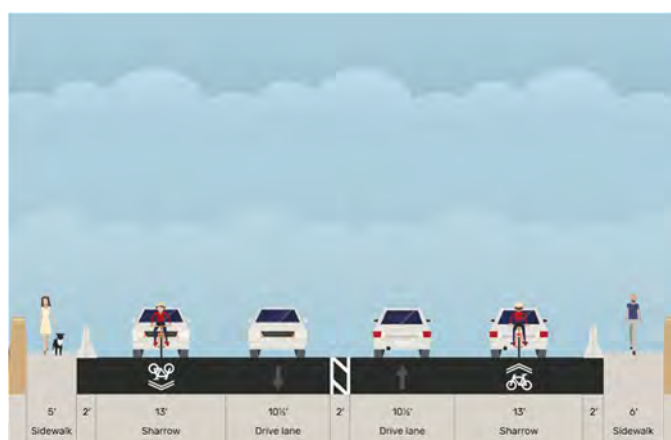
Existing Cross Section of Admiral Way Bridges (64-foot Wide)
